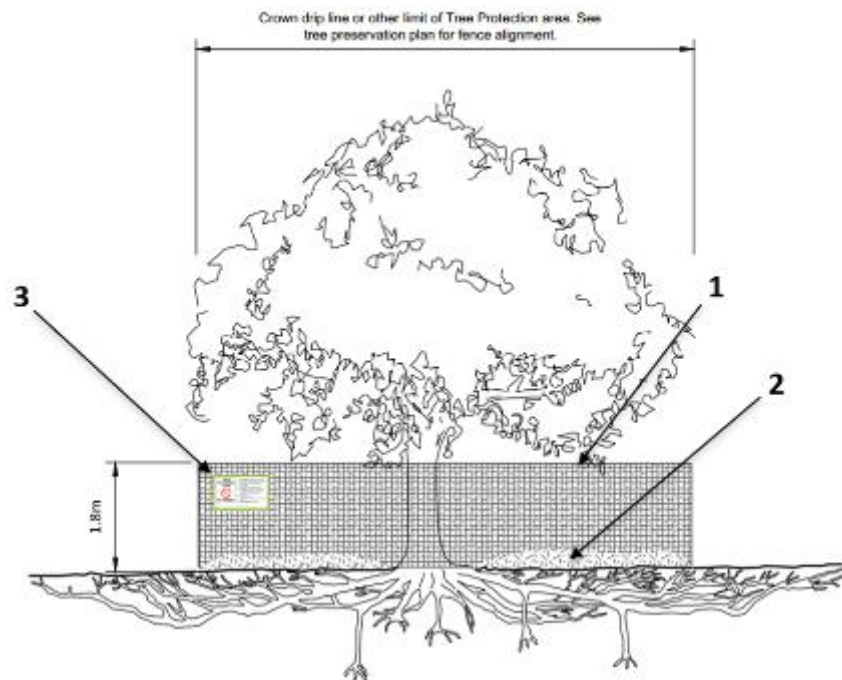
Tree protection zone detail. 1. Tree Protection Fencing- To consist of chain wire mesh panels with shade cloth (if required) held in place with concrete feet or plywood or wooden fence panels. Fence to be a minimum height of 1.8m and to be established to the extent of the TPZ as directed by the project arborist. AS4687 specifies applicable fencing requirements. 2. Mulching – The area within the TPZ is to be mulched (where practical) and maintained to a depth of 100mm. Mulch is to comply with AS4454. 3. Signage – Signs identifying the TPZ should be placed around the edge of the TPZ and identifiable from within the development site. Lettering on the sign should comply with AS1319.
